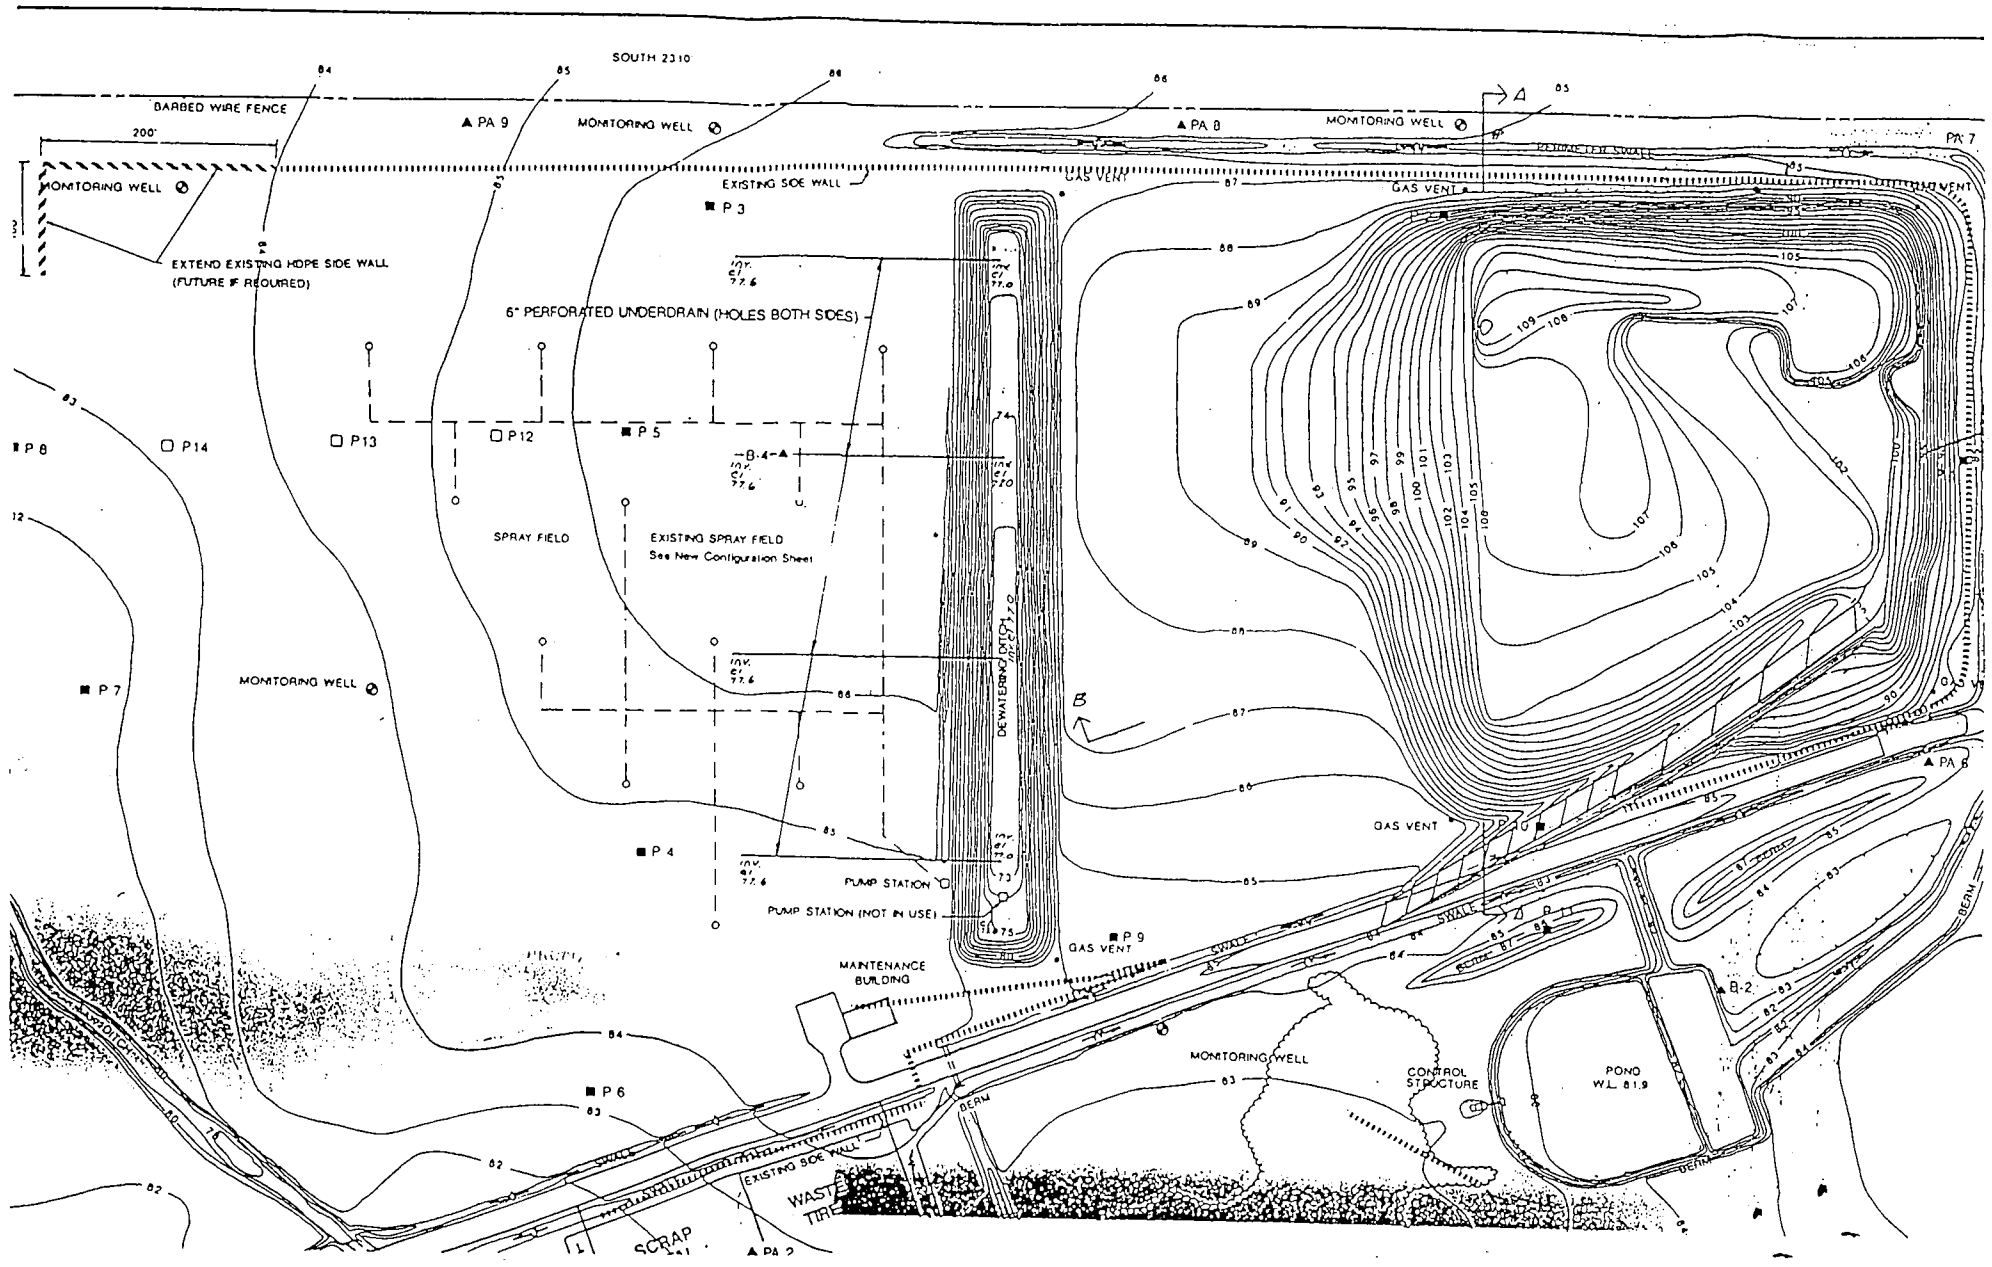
Improvement Site Plan (per 8/2/93 Wade-Trim Sheet 4/6)
